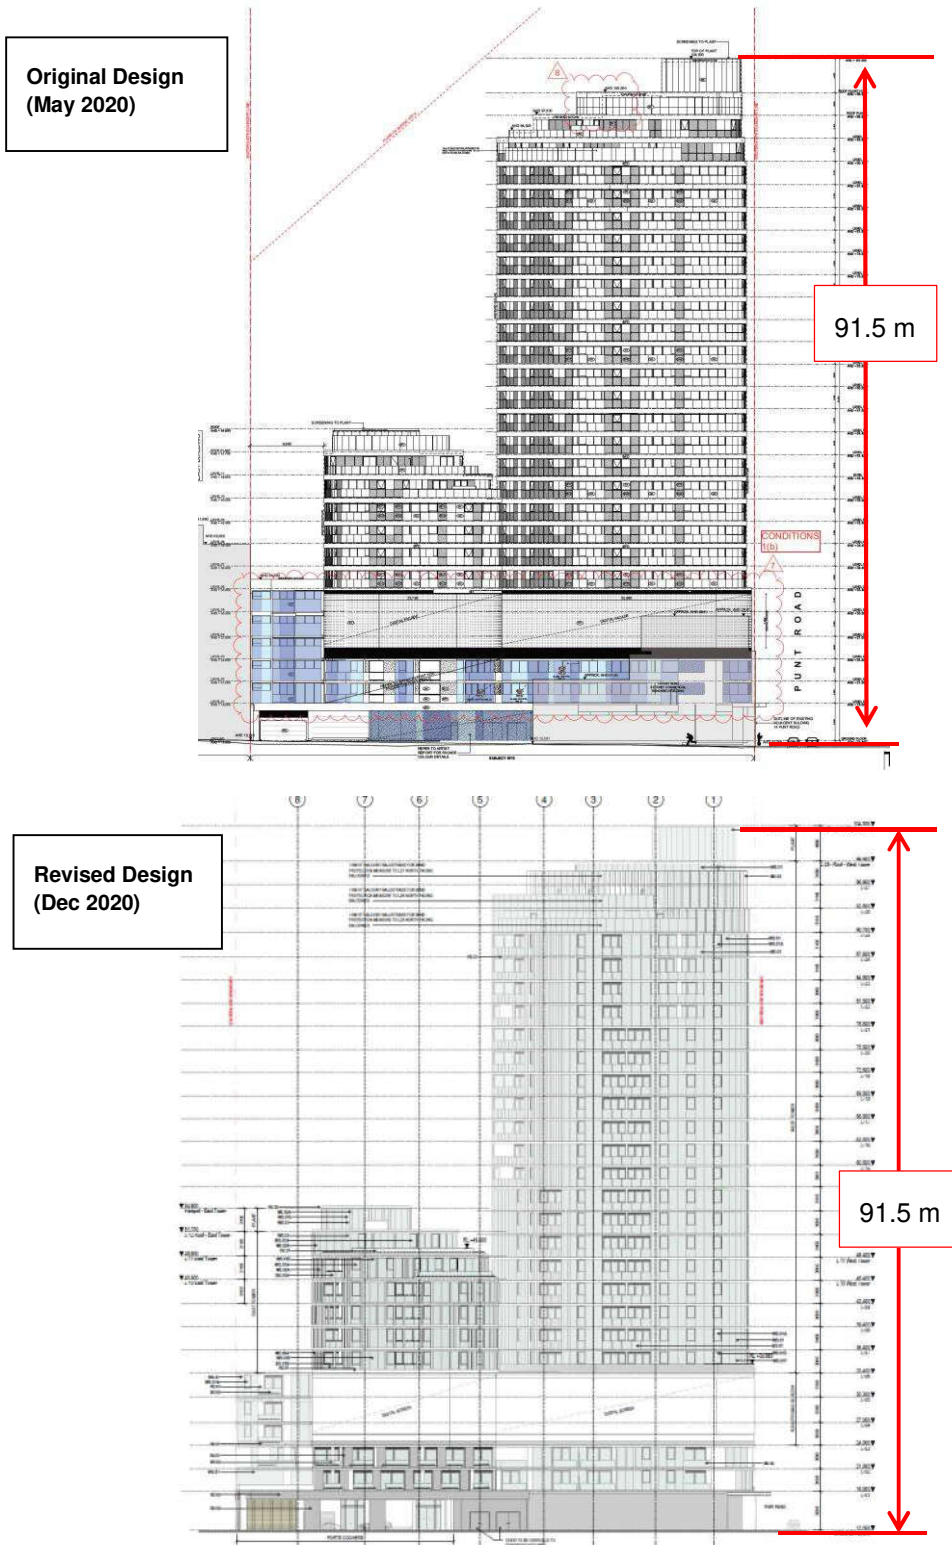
North elevation for the development at One Wellington, St Kilda - comparison between the revised design and the original design tested in the wind tunnel
